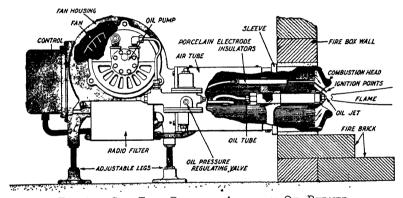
Gun Type Pressure Atomizing Oil Burner
